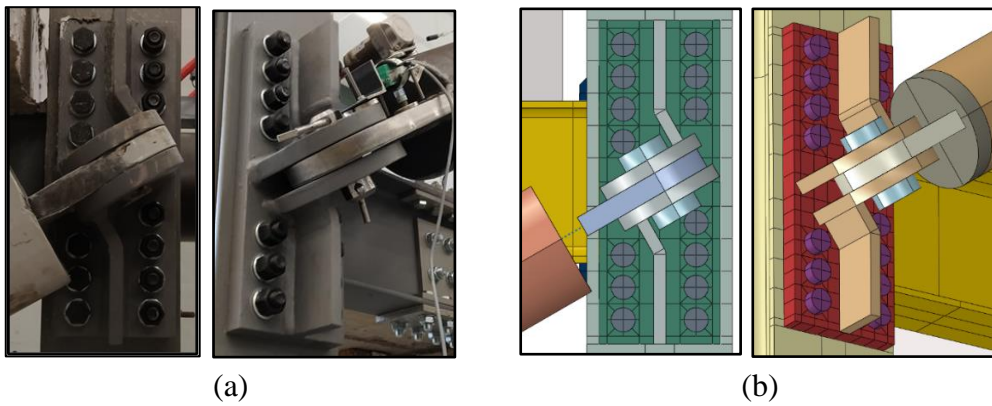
BRB to Column Connection: (a) Test specimen, (b) Abaqus model
